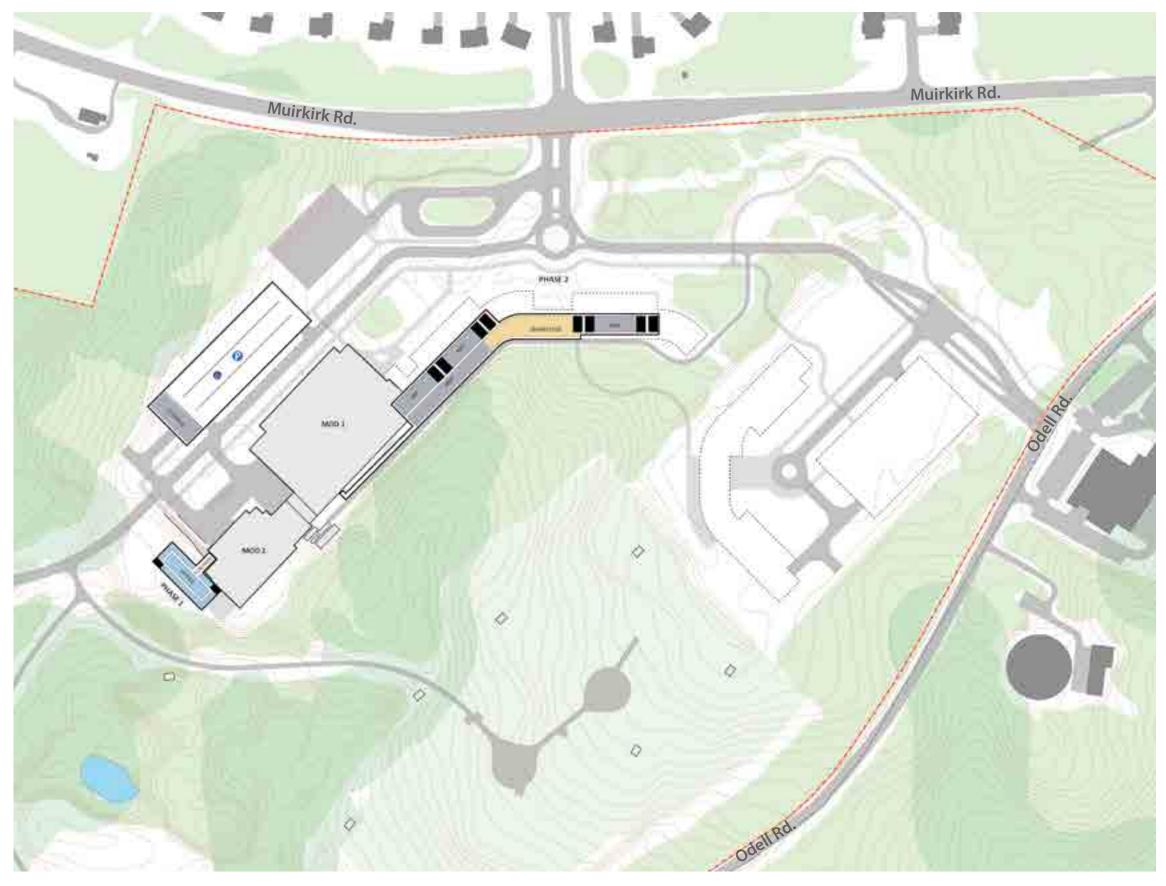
Preferred Alternative B3 Phase 1 ground floor plan
